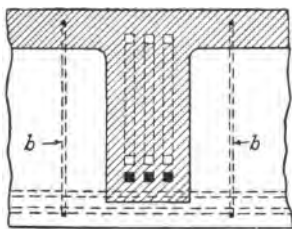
Details of Reinforcement at Junction of Beam and Girder
